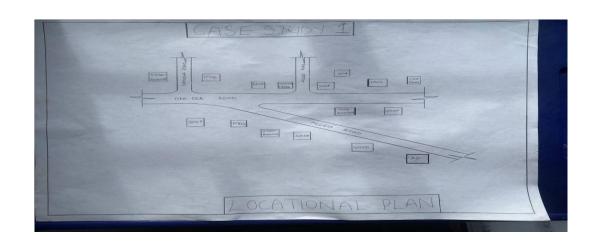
LOCATIONAL PLAN OF CASE STUDY ONE
